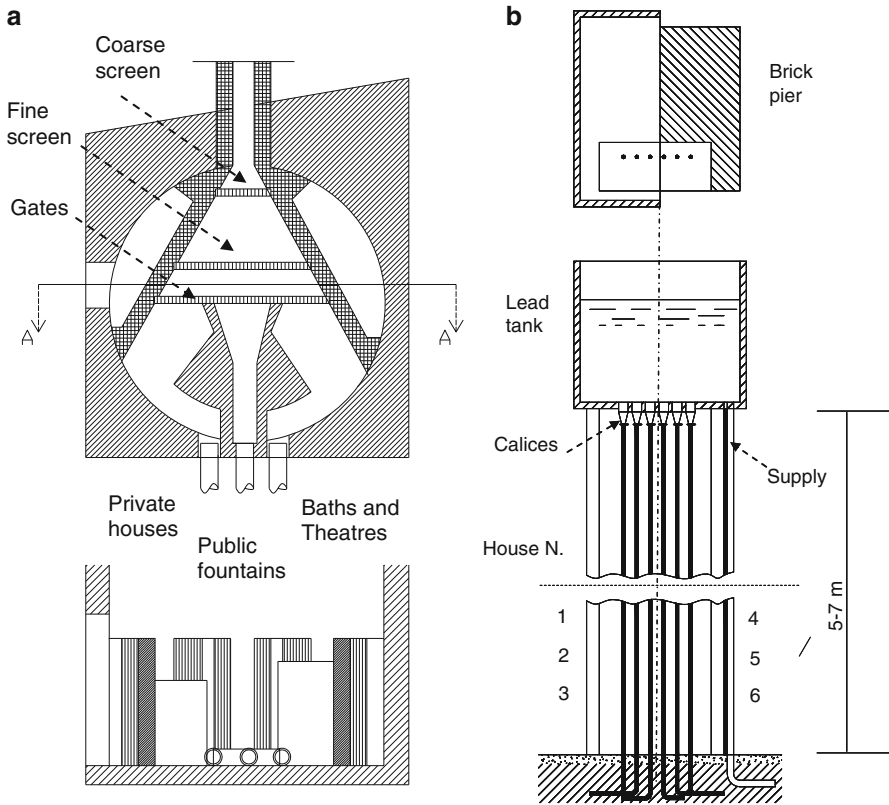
(a) Plan of distribution arrangements inside *castellum divisorium* (or *castellum dividiculum*) at Porta Vesuvii: plan et elevation; (b) Pompeii water tower or *castellum secundarium* (Source: Refs. [25, 29])
